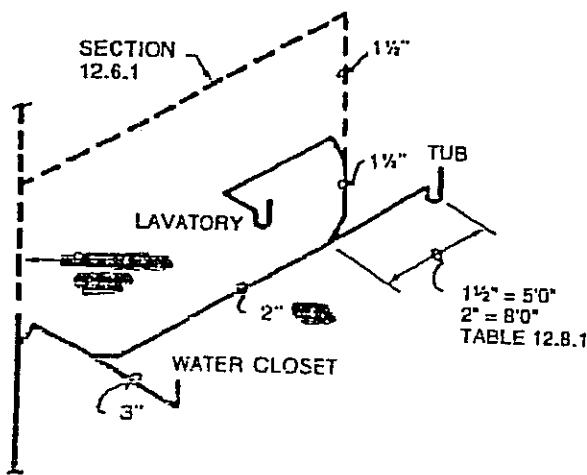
AN EXAMPLE OF A VENTED BATHROOM GROUP SINGLE STORY OR TOP FLOOR OF A MULTIPLE STORY STRUCTURE
